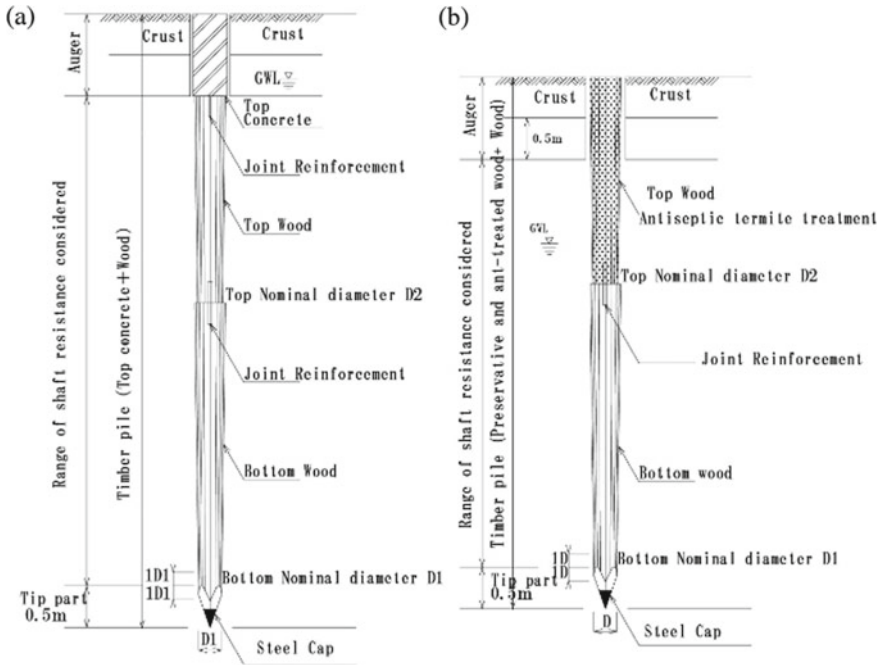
Schematic of Jointed-timber pile a Top concrete as a cap, b treated timber as a cap
